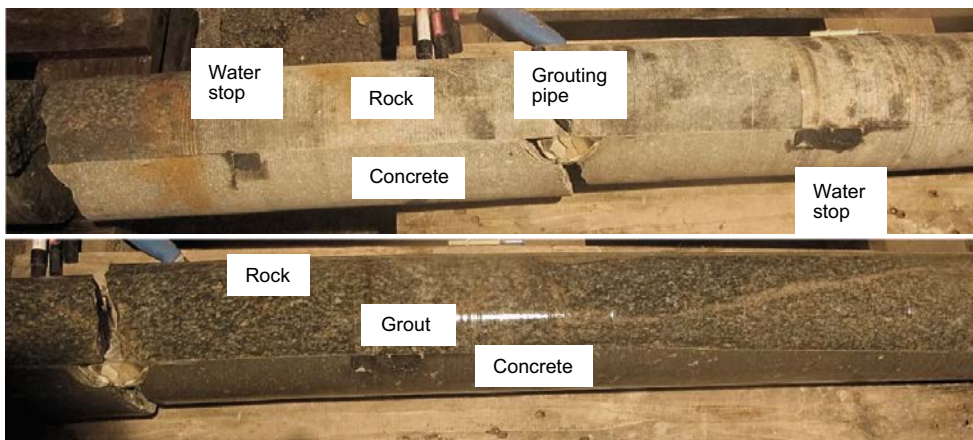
Drill core “center” (left) and void on top of the concrete (right).
